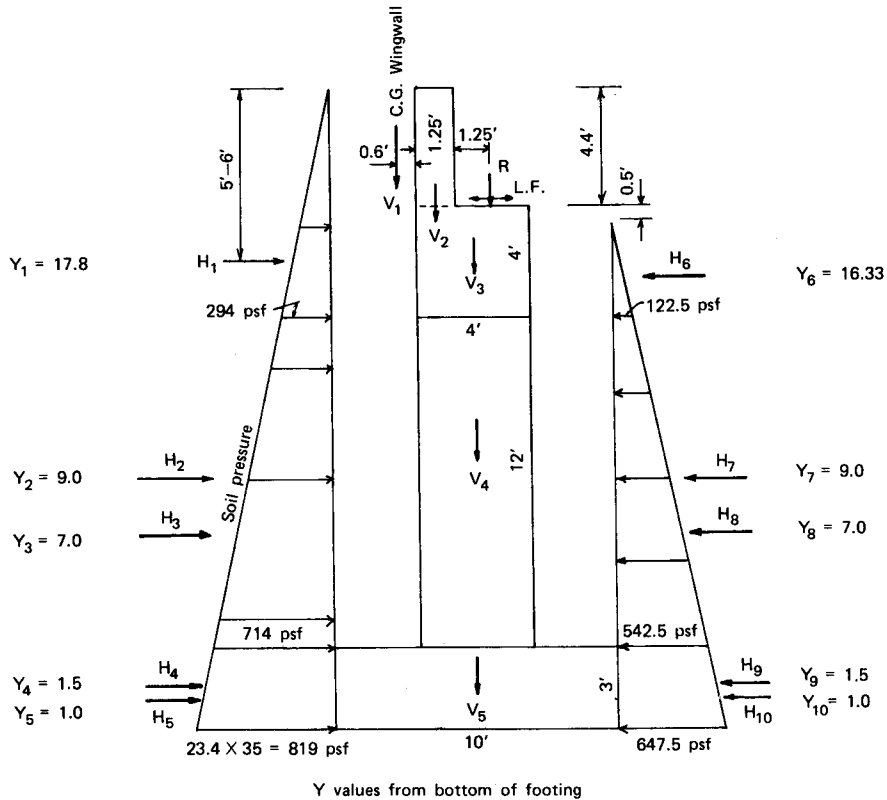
Loads on forces acting on abutment, example of Figure 7-26.
